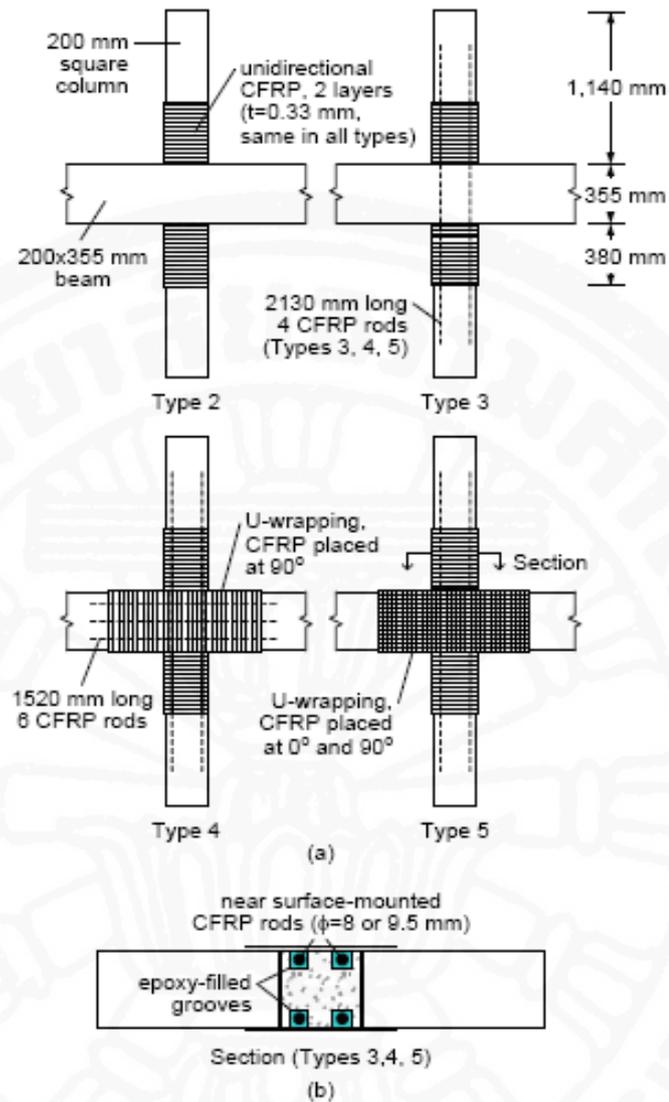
Specimens strengthened with CFRP sheets and/or rods, tested by Prota et al. (2001; 2002): (a) elevation, (b) plan.
